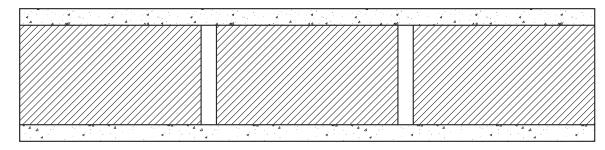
C4f: Single leaf of 220 mm brick masonry with 13 mm cement render on each face
